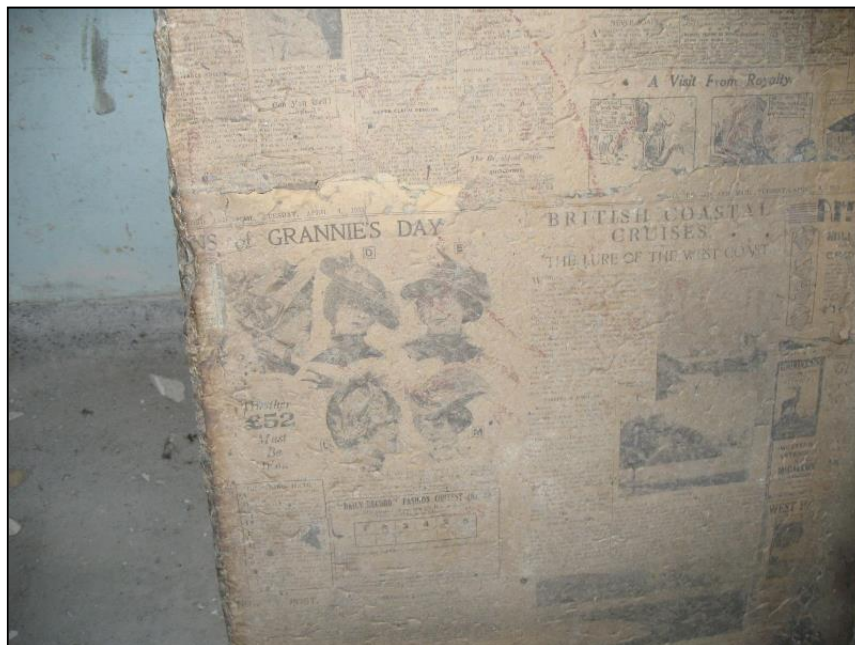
Preserved 1930s Newspaper on Underside of Terrazzo, Corridor 005 Extension
